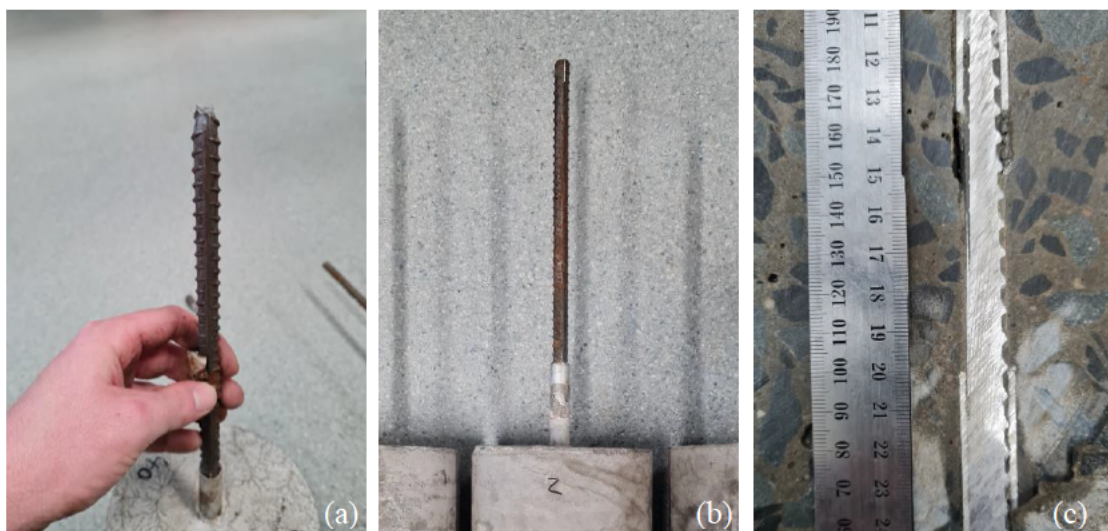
(a) rebar failure (b) slip failure (c) concrete sample cut in half
